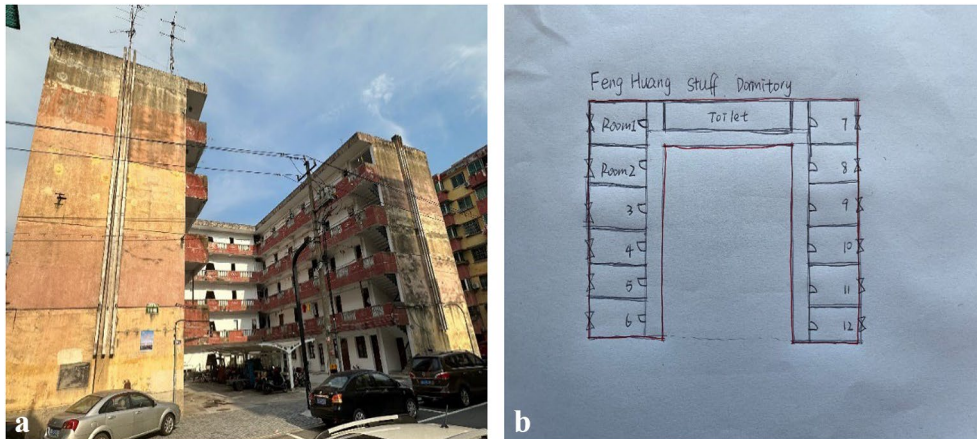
Façade (a) and Floor Plan (b). Tong, Sujun and Yurong Ling. Exterior of Fenghuang Village dormitory. June 9, 2023. Ling, Yuying. Sketch of Fenghuang Village dormitory floor plan. June 10, 2023
